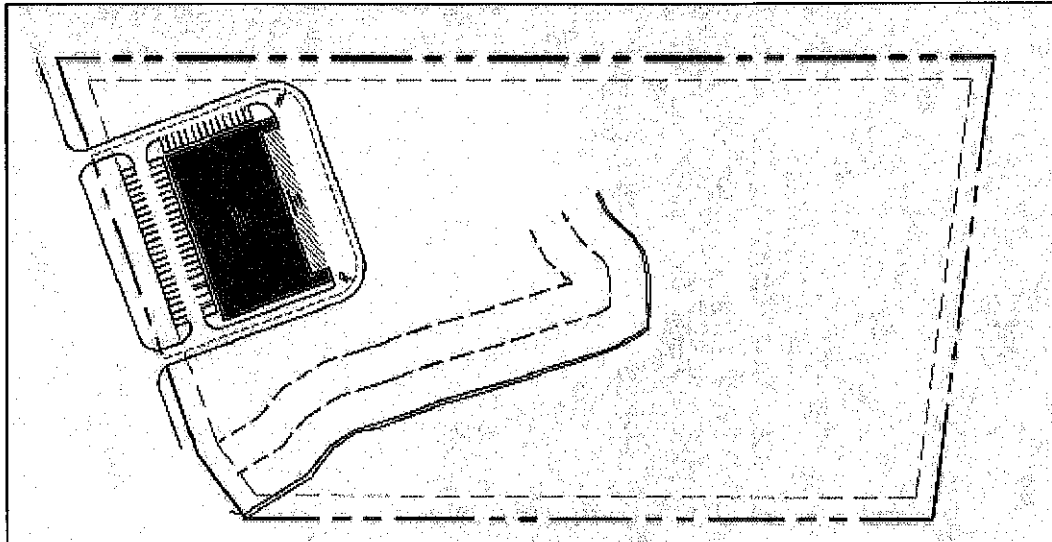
Concept plan (Source: Fotenn Planning + Design)
